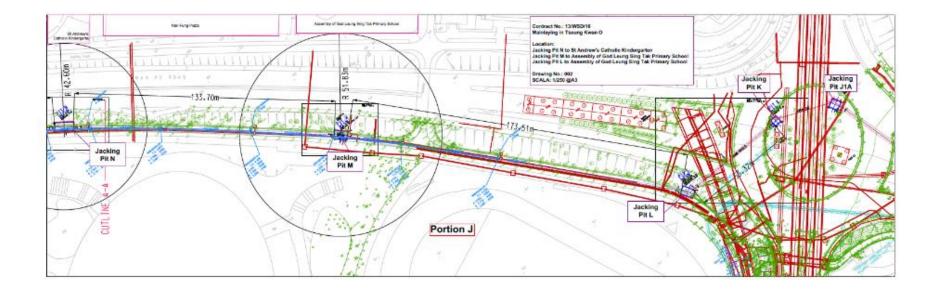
Location Plan for Portion J – Pit L-M-N, K, J1A
